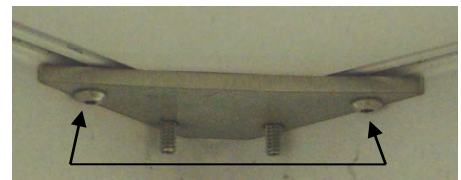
FFU on bottom load filter or walkable bottom load filter clip at corners of grid opening. Torque the screws.
